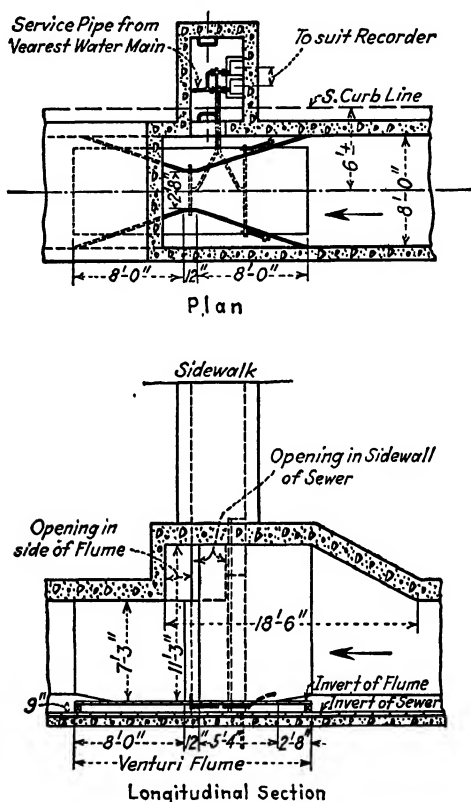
Venturi flume inserted in East 41st street sewer, Manhattan, New York.
